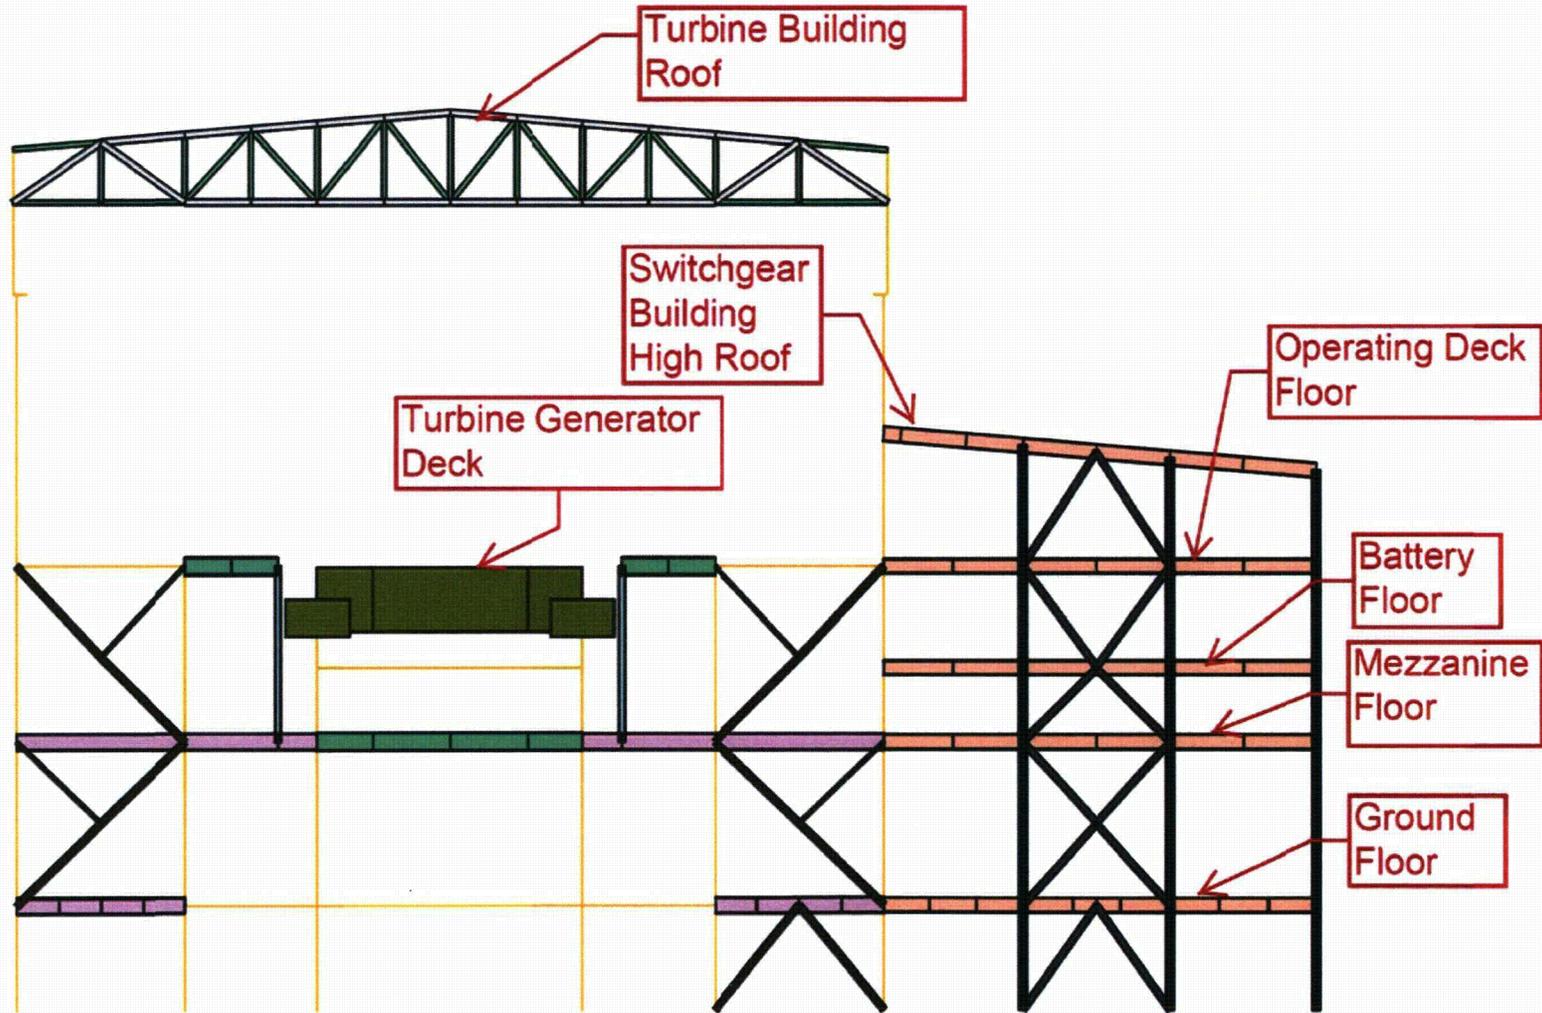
{Cut - Isometric View of the Turbine Island Structure with shear walls (GT Strudl Finite Element Model)}
